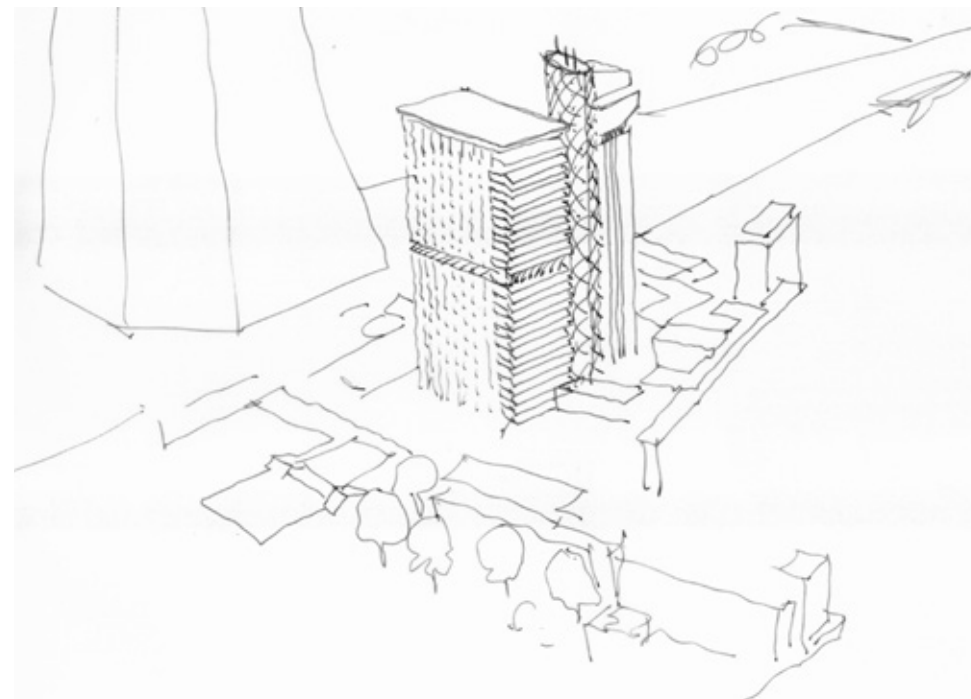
Penoyre & Prasad Architects' sketch of the proposed overcladding of Guy's Hospital Tower
